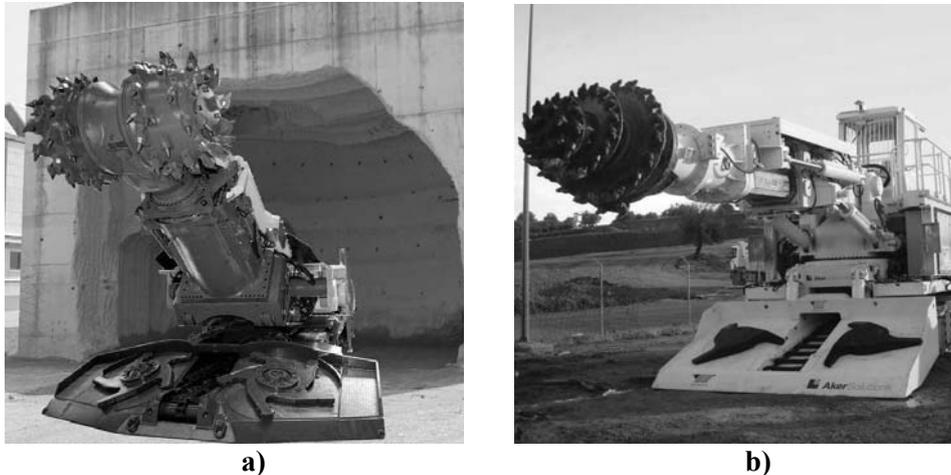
Roadheaders: a)ripping roadheader - Sandvik Hardrock Miner MH 620; b) milling roadheader - WIRTH Paurat
